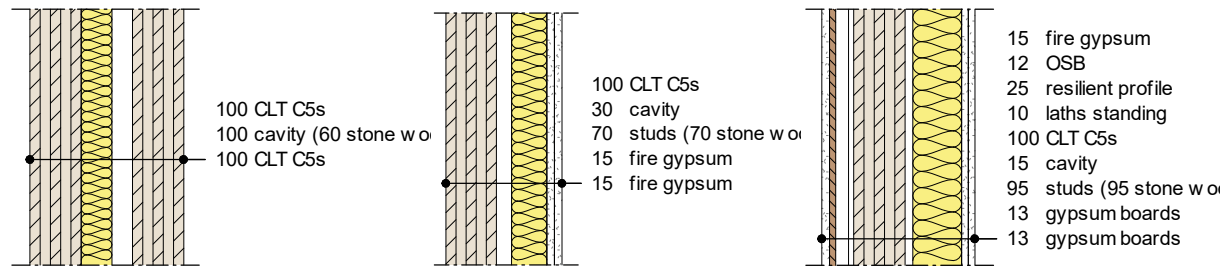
Wall configurations 4 to 6 with 100 CLT C5s (calculation no 4, 5 and 6).
